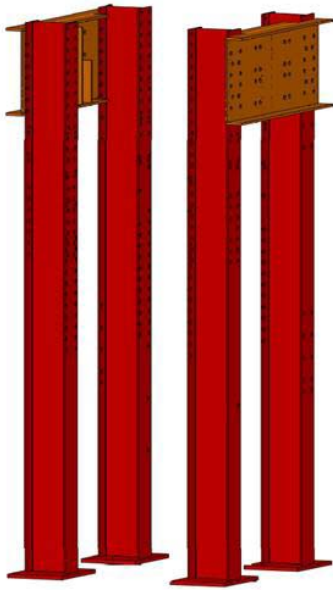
Three Dimensional Drawing of Laboratory Test Frame
